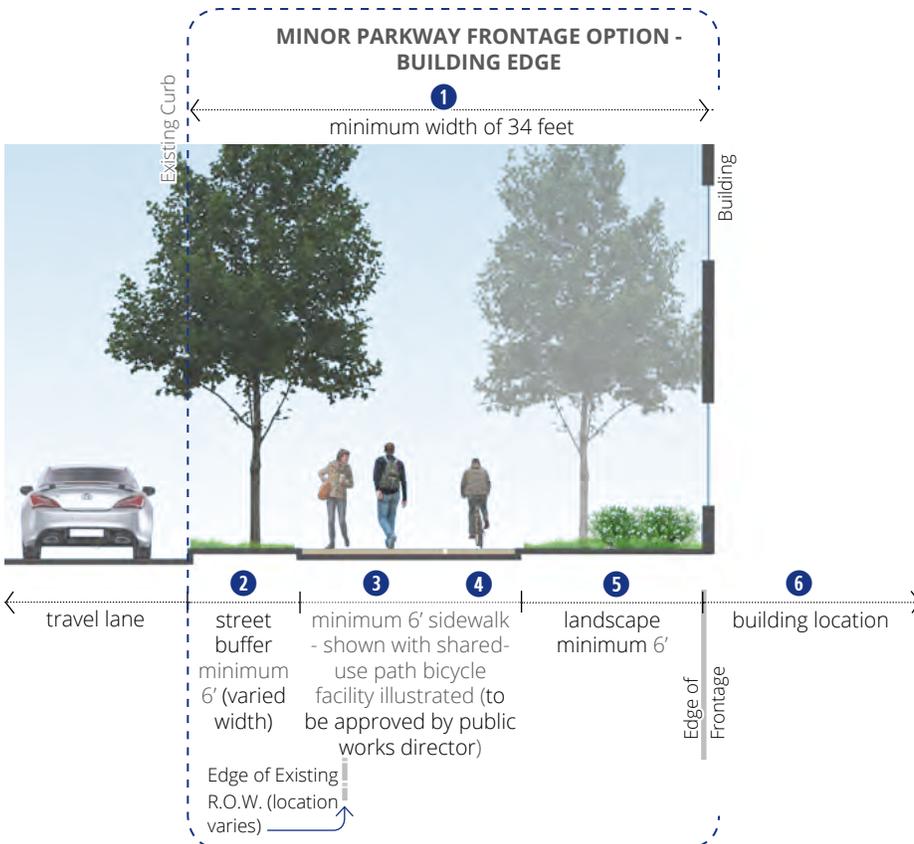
Minor Parkway Frontage Option - Building Edge
